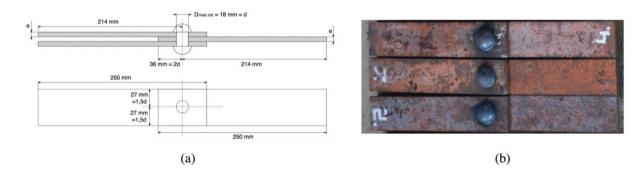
Riveted specimens fabricated from puddled iron pieces recovered from the Bridge over the Adour river (France); (a) layout of the specimens; (b) some examples of the fabricated specimens.
